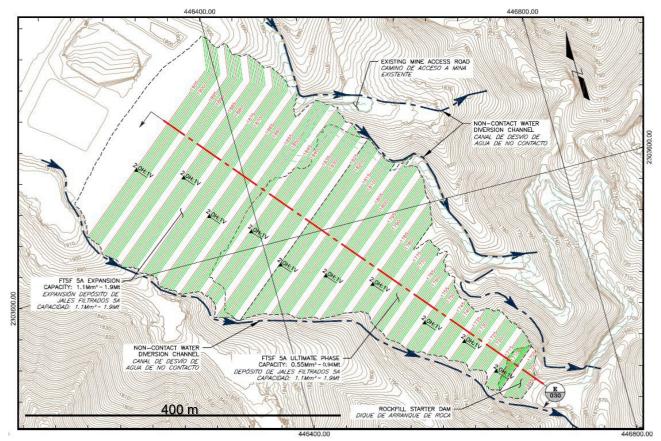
TSF5/TSF5A Filtered Tailings Layout
